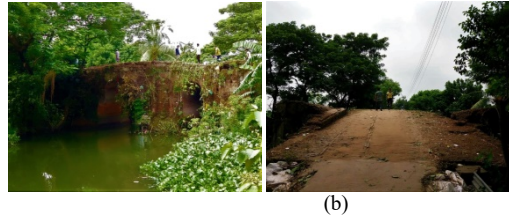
(a) Chapatali Brick Bridge, (b) Frontal view of Chapatali Bridge
